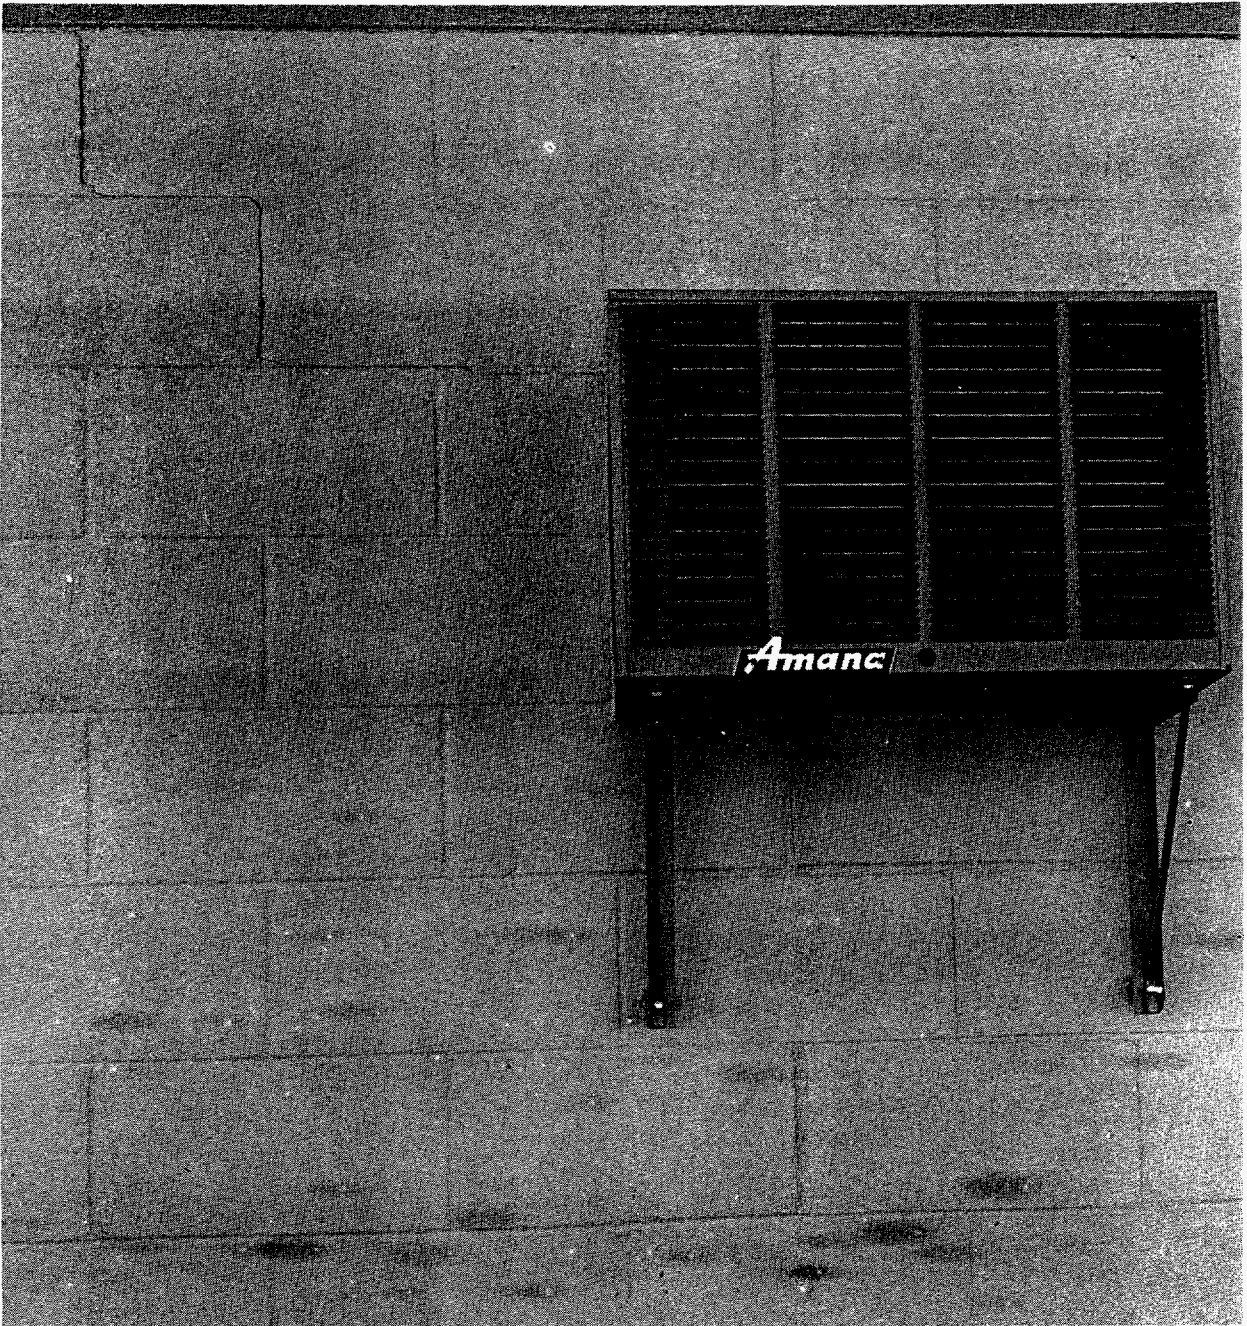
Typical existing crack, 1 Dec. 1965.
